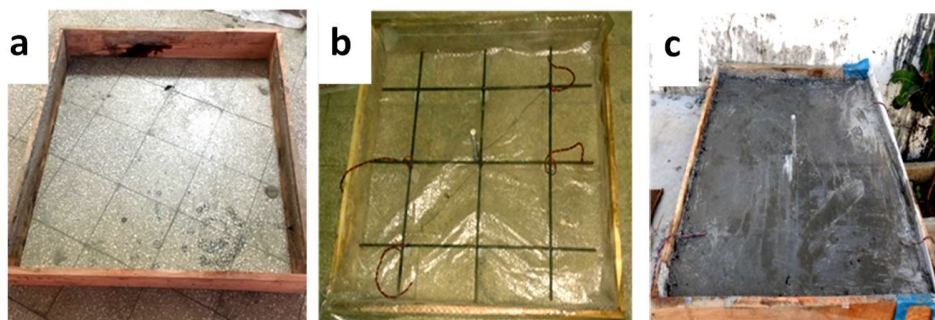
Fabrication steps for concrete slabs: (a) formwork; (b) reinforcement cage; (c) slab after concreting.
